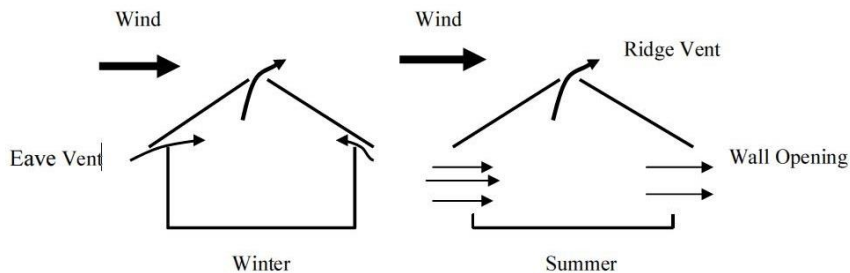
Typical openings used for natural ventilation of dairy buildings [2]
